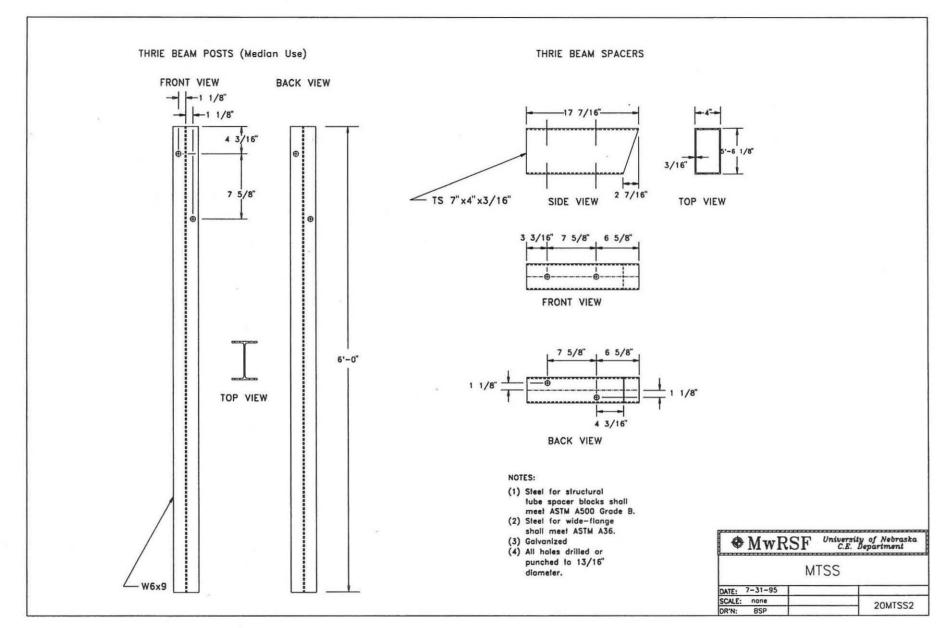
Thrie Beam Post and Spacer Details, Design No. 2
